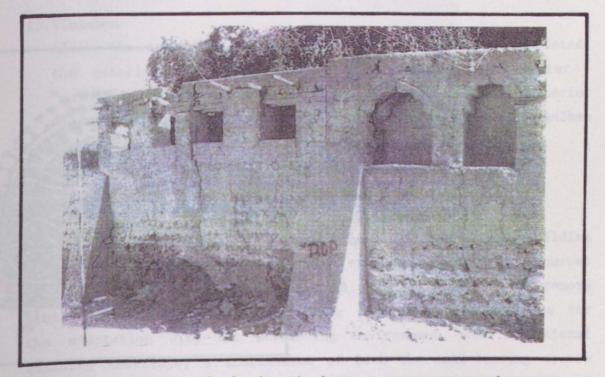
A photograph showing the buttresses constructed to support a cracked wall (15).
